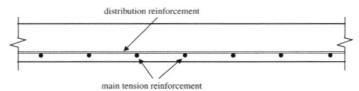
Cross section through a one-way solid slab showing main reinforcement and distribution reinforcement
